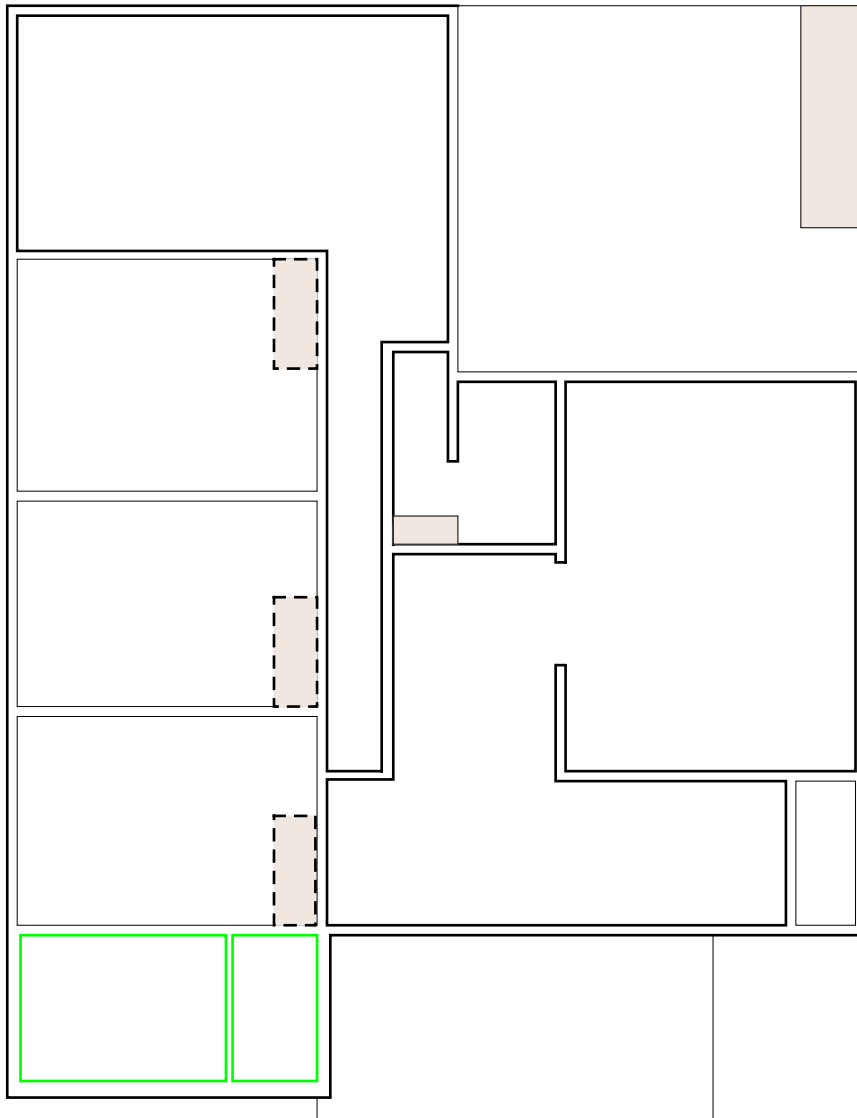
Plan view of existing house (black, with closets in darker shade), including part of wooden deck that will remain and carport (light gray outlined exterior parts) and addition to south (bottom of drawing). See variance application for maximum dimensions of the addition.
